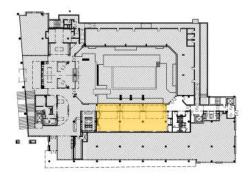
| Level 1 Lighting Layout - Kitchen + E-Lounge
